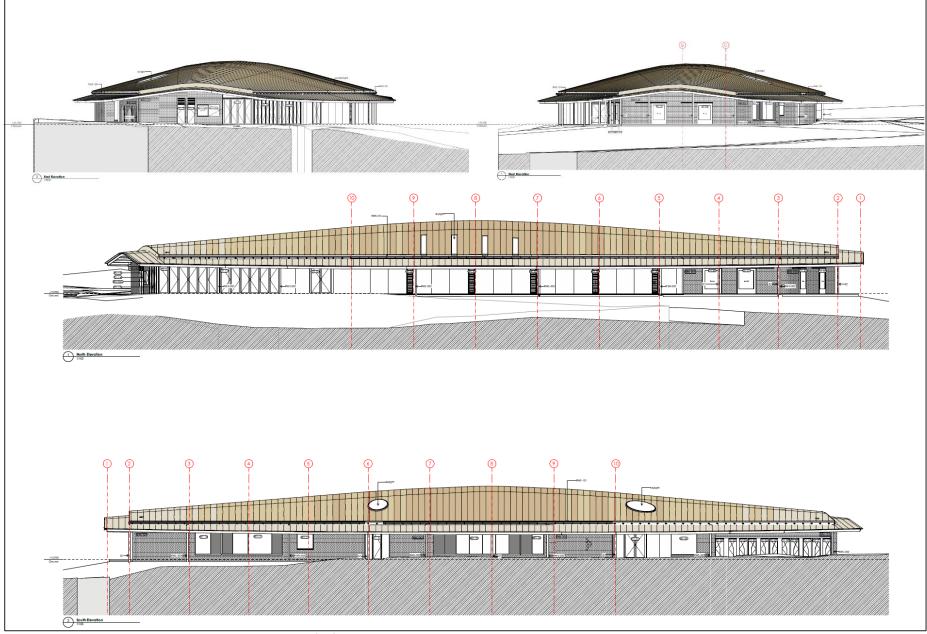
Visitor Centre Elevations (Neeson Murcutt + Neille, 6/04/2023)
